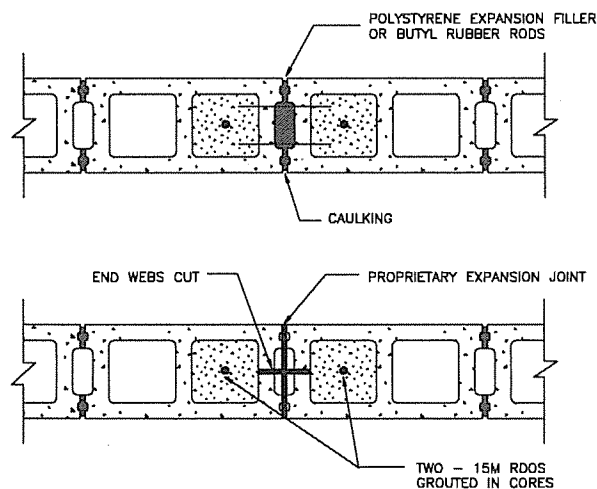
Detail of Typical Movement Joints in Concrete Masonry Wall
